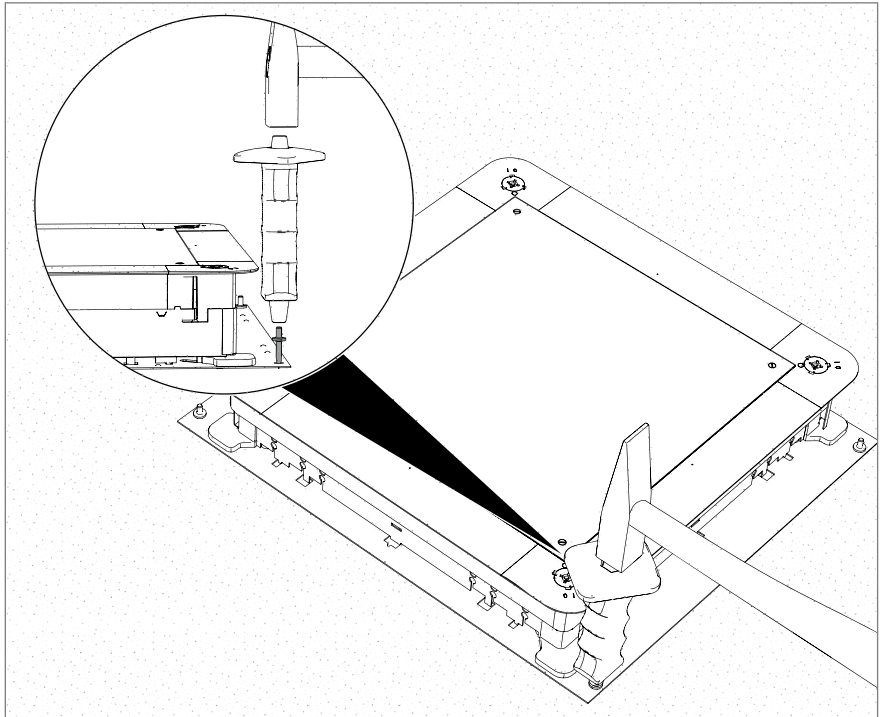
Fastening the underfloor junction boxes/underfloor device sockets
